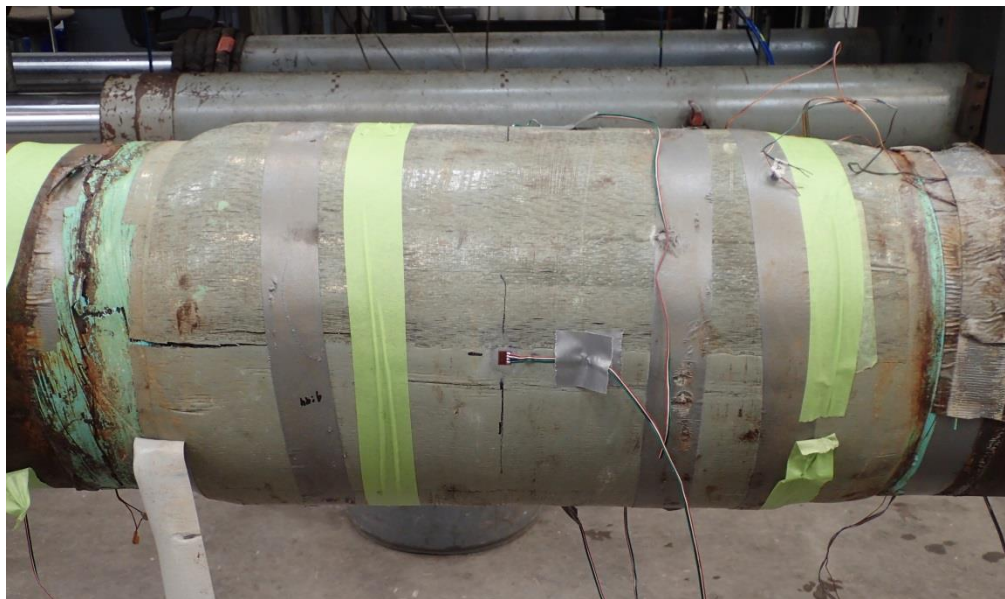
Manufacturer C's tensile sample (OFF-C-T-J3-3) post test with cracks near edges
